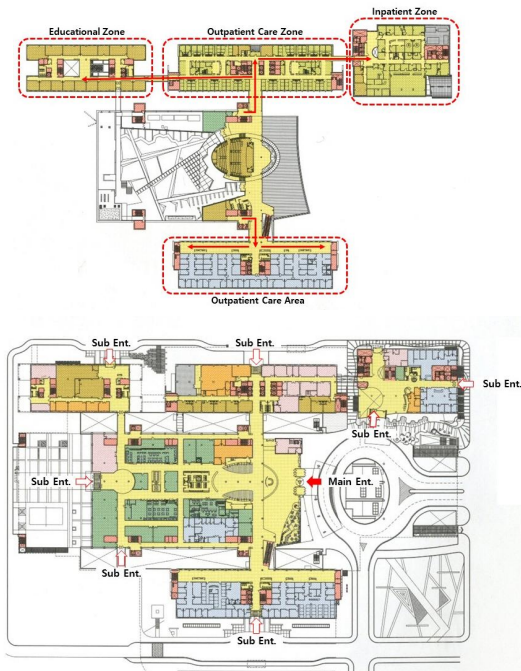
Site Plan and 4th Floor Plan of Medical Facility (B- Univ. Hospital)[5]
